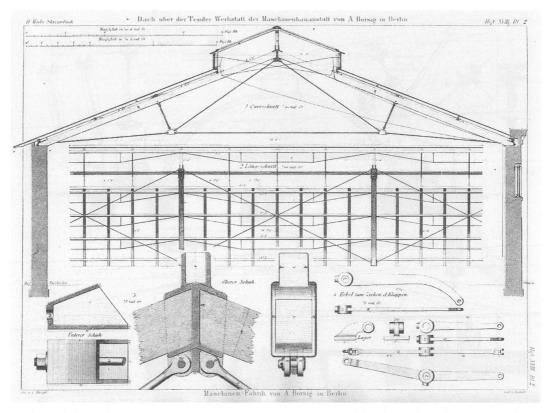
Polonceau truss roof A. Borsig, 1844, 1856
